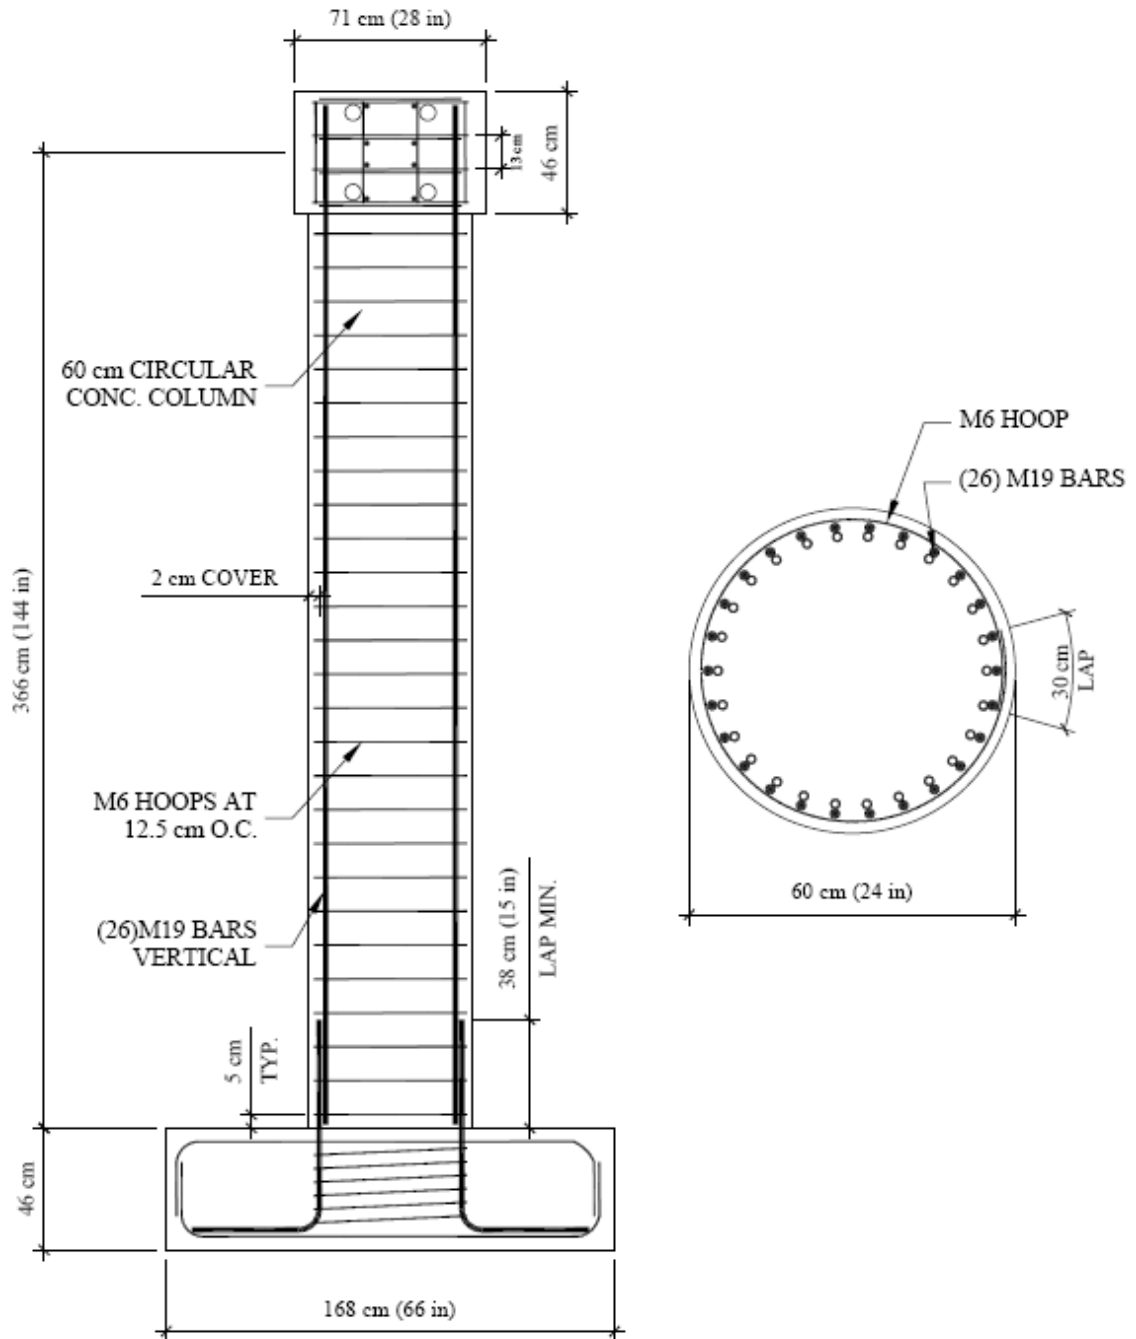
Details of the Circular Lap Reinforced Flexure Column Test Specimen
